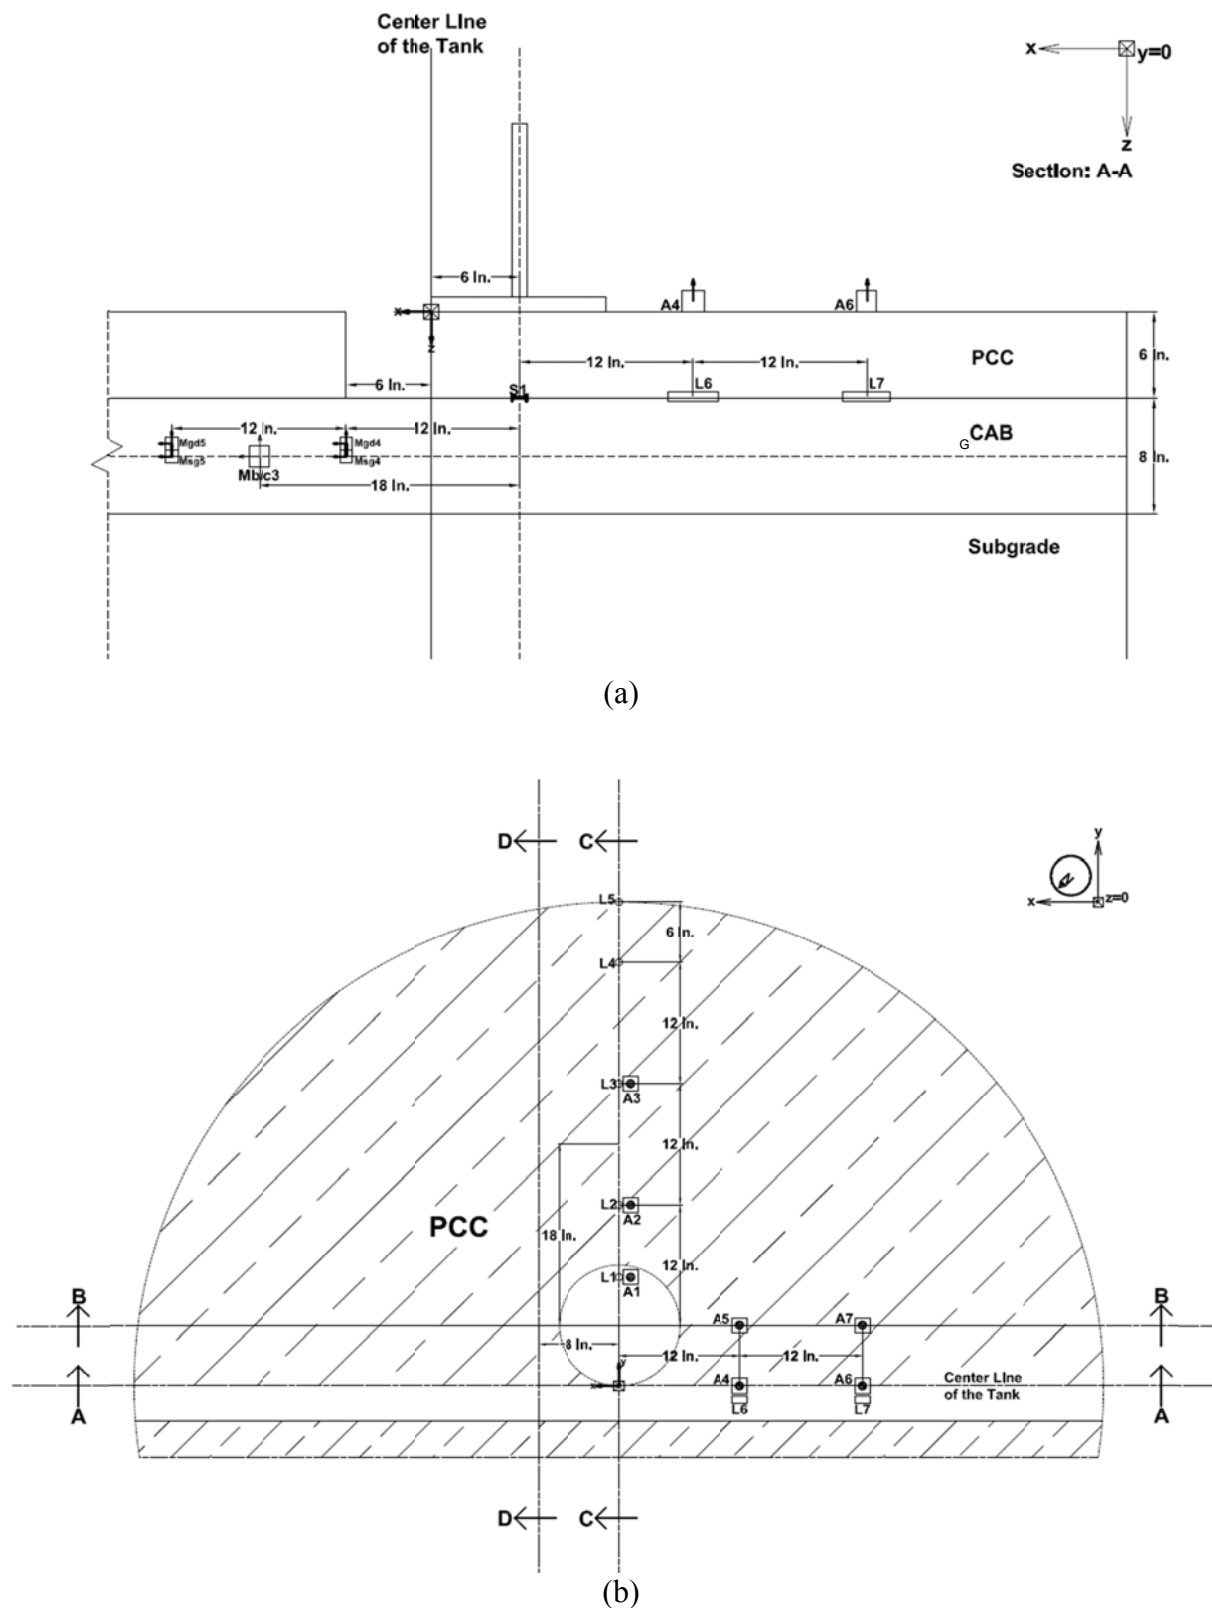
Instrumentation Plan for Rigid Pavement Experiment 9: (a) Profile View at Y = 0 inch; (b) Plan View at Z = 0 inch
